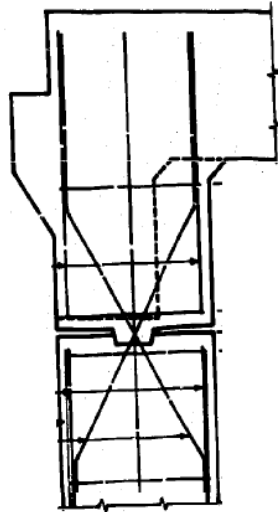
A pin connection is created between the superstructure and substructure of Bridge 3 by arranging the rebar such that all bars cross between the abutment and superstructure in the same plane.
